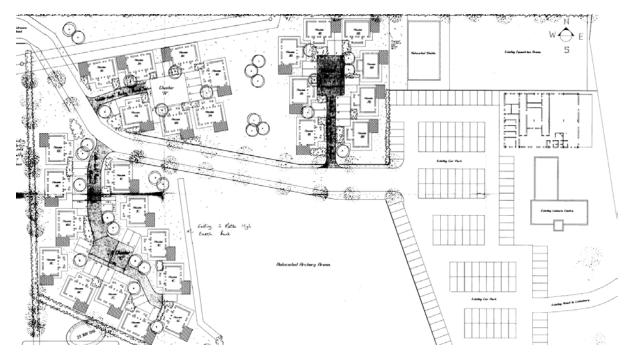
Reg. Ref. 964427 Proposed Site Layout
